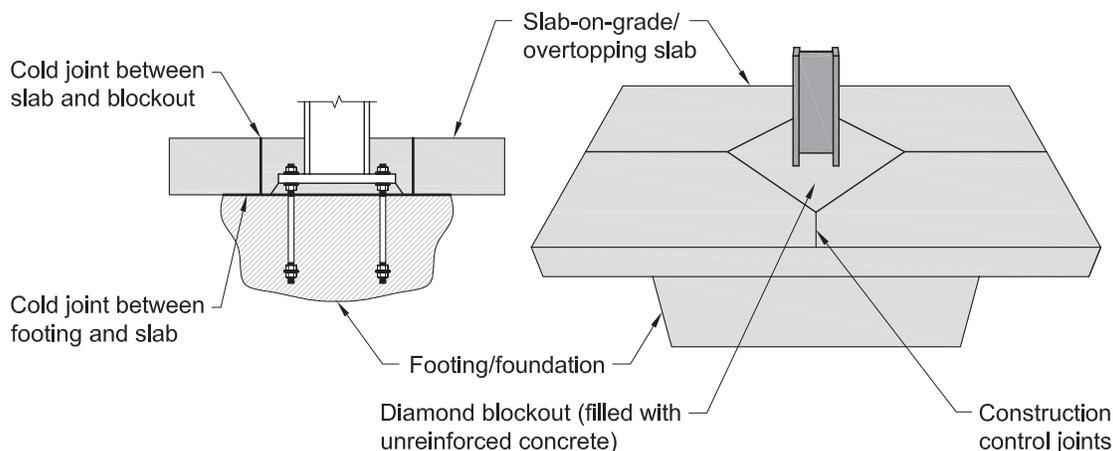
Breakout connections resulting in shallow embedment of base plate connections.
